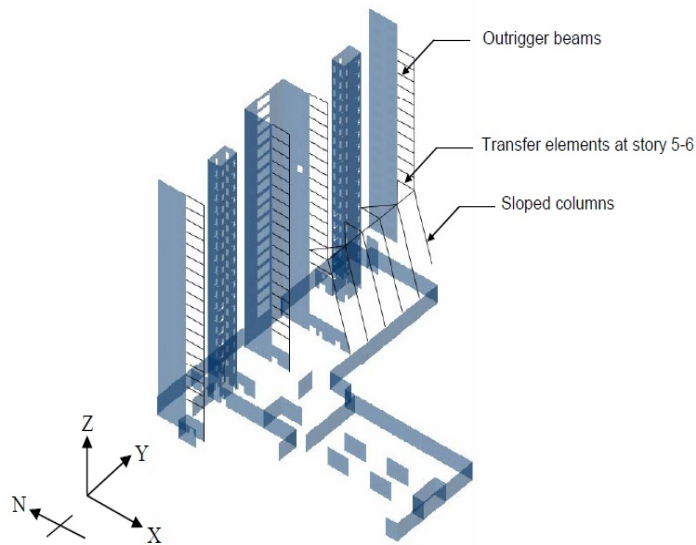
Isometric View of Analyzed Concrete Tower Building
